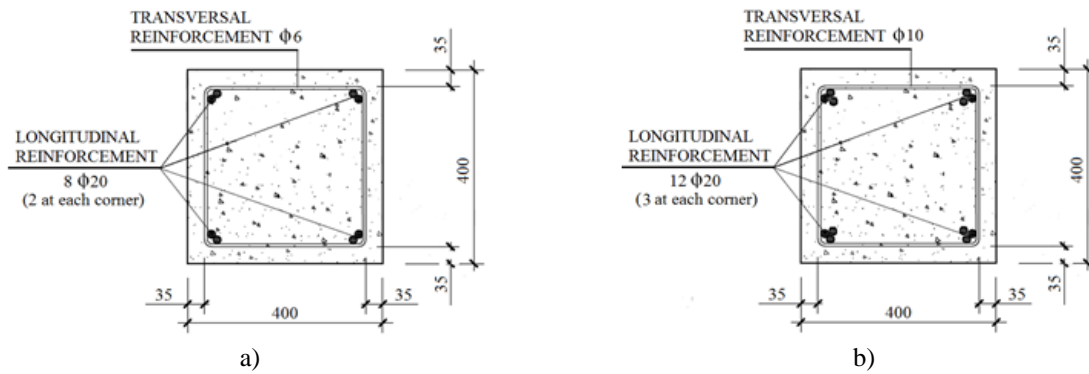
a) Cross-section of the piles reinforced with steel bars and b) cross-section of the GFRP reinforced piles (dimensions in mm).
